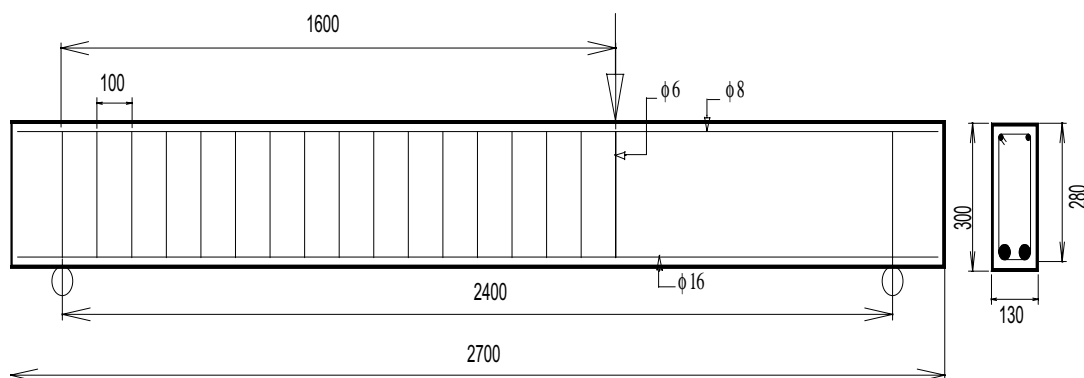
Test reinforced concrete beam geometry (dimension in mm)
